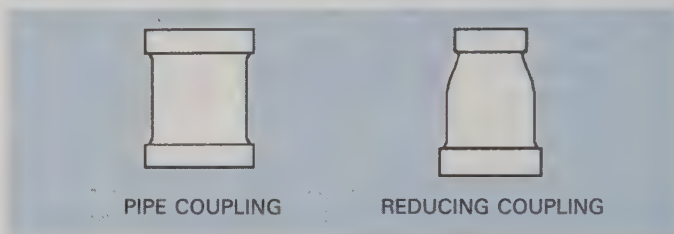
Couplings connect pipe lengths in a straight line. The reducing coupling allows different-sized pipes to be connected.
